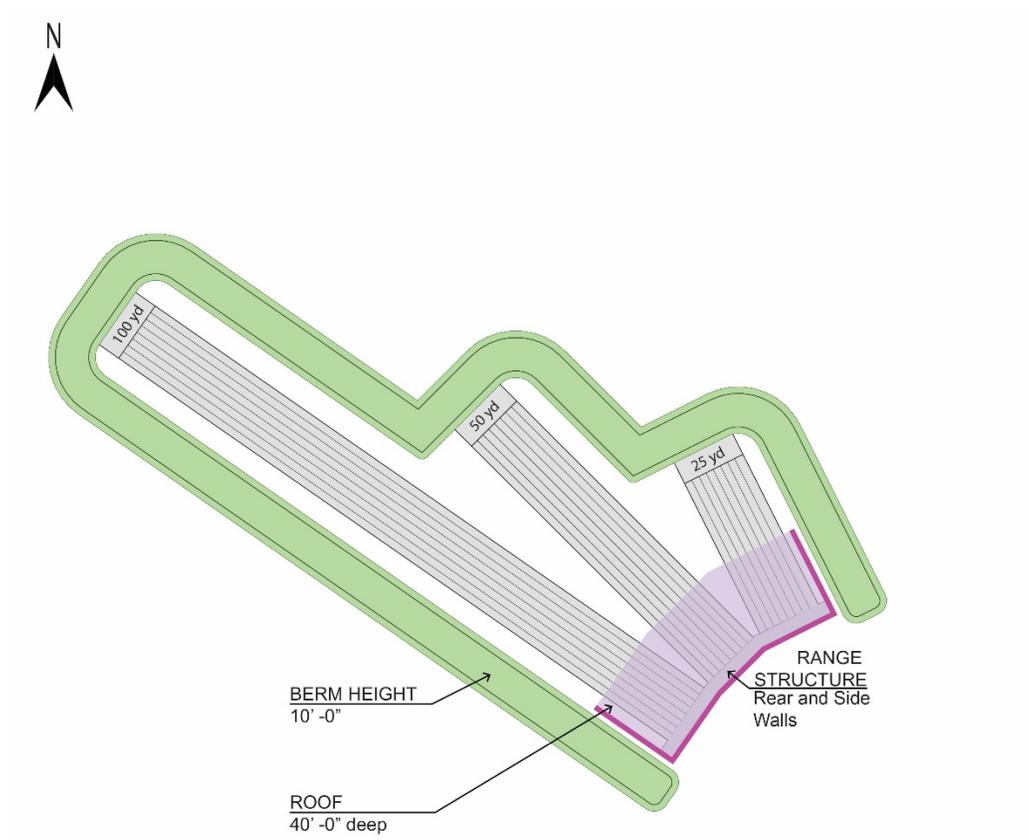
Concept plan for the range structure with the 40 ft. extension of the roof with the rear and side walls added and the interior sound absorbent lining described in Appendix N.
